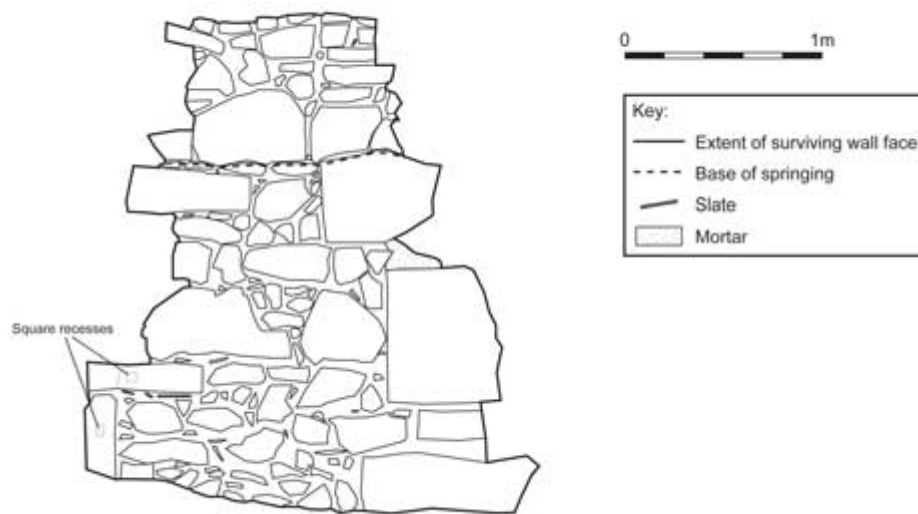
; Structure 5, Rusticated Arch: Elevation d
